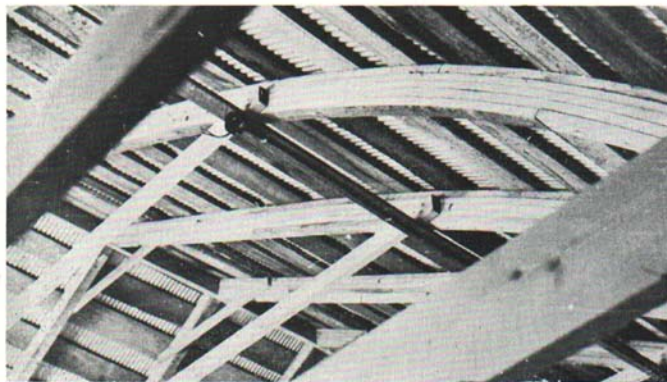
Looking upward at the laminated rafters of a two-story laying house during construction.
